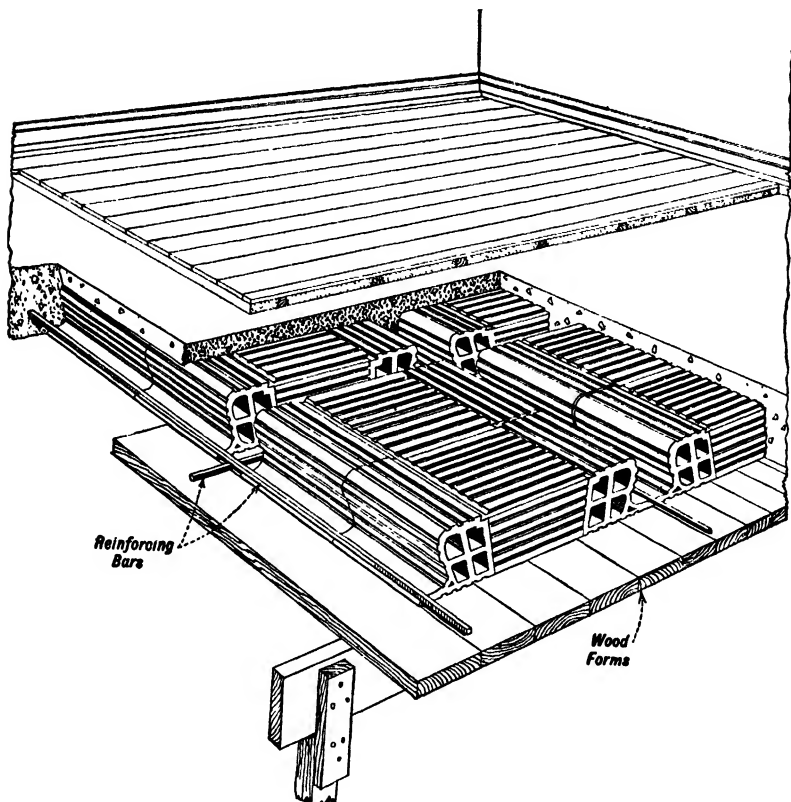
Hollow Clay Tiles for Two-way Combination Floor. (See p. 592.)
